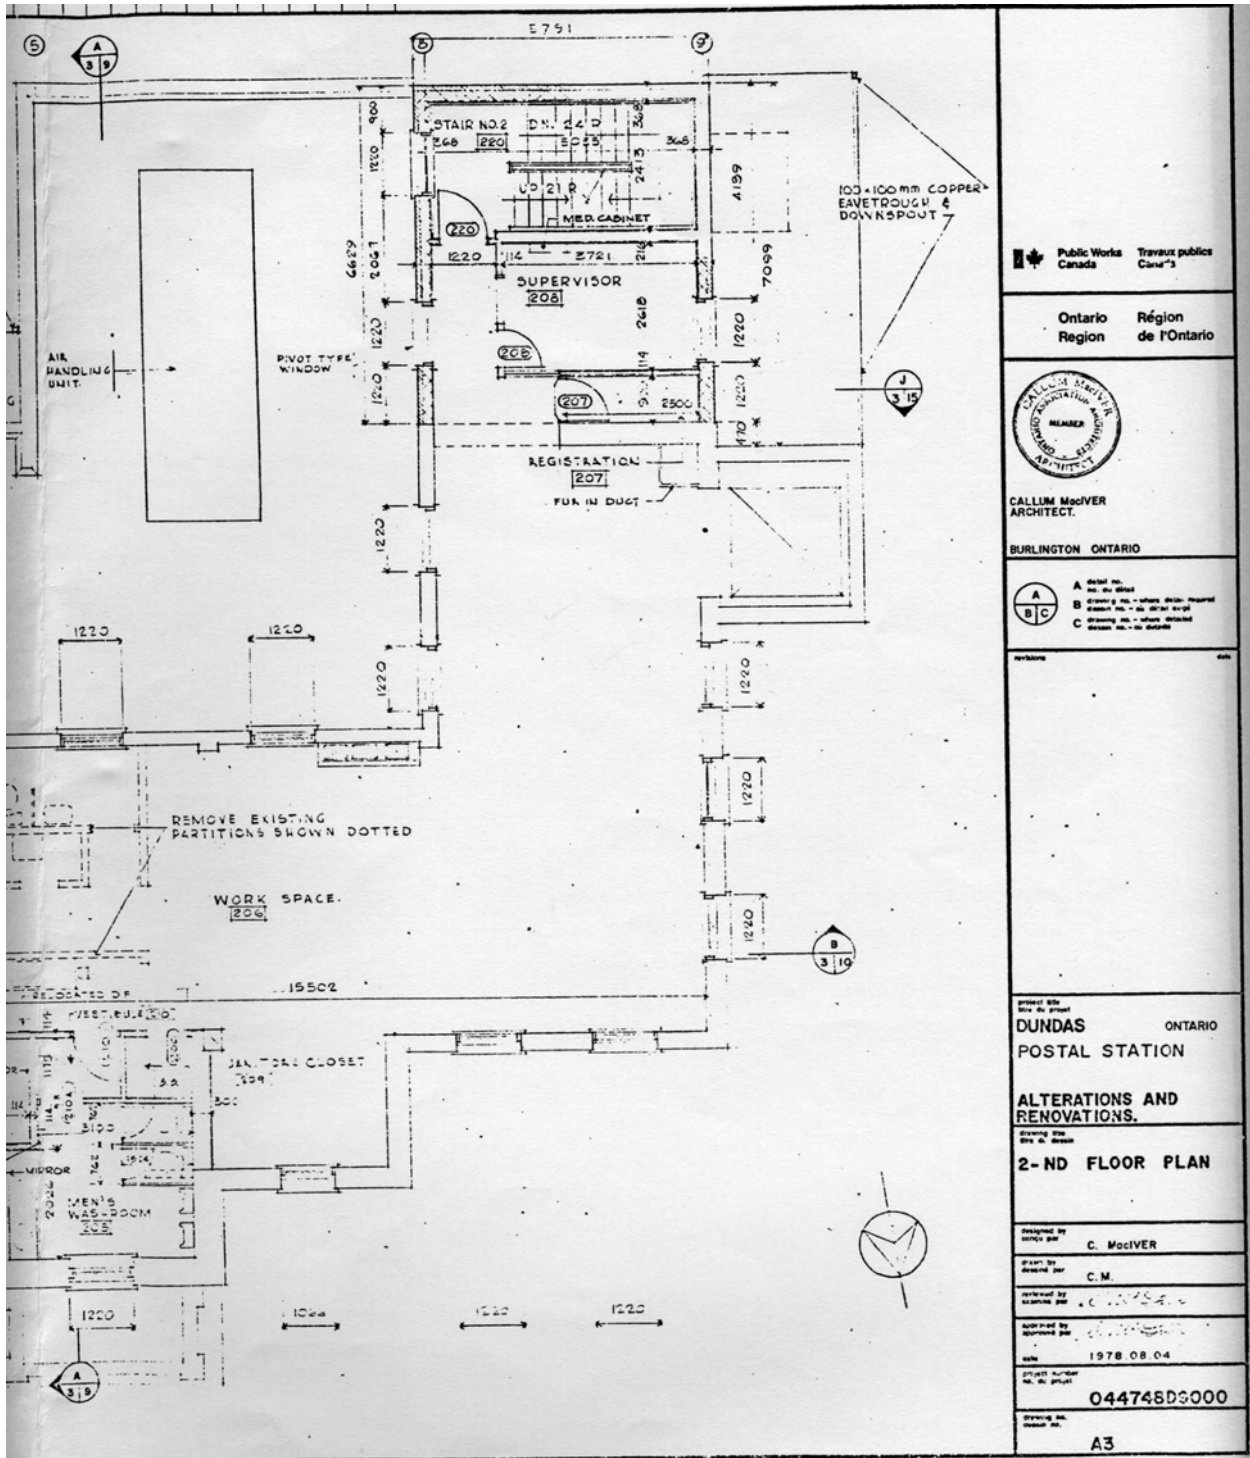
Drawing No. A3: West half of the second floor plan from the 1978 set of drawings for proposed renovations and additions, showing the layout of the second storey addition to the pre-1949 rear extension.
